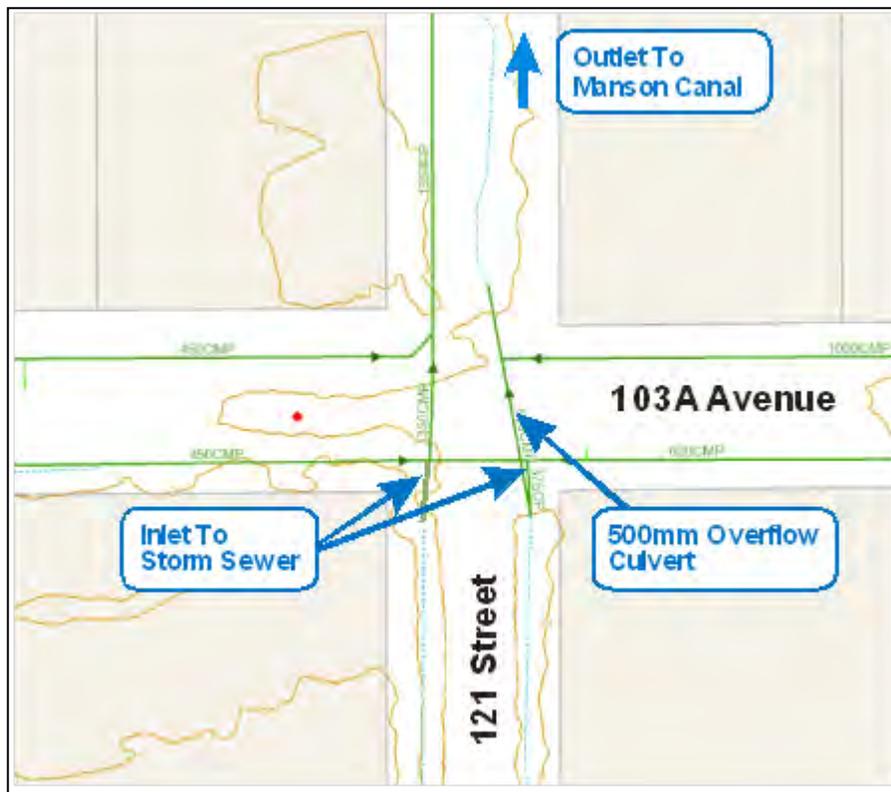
Conveyance Piping at Intersection of 121 St and 103A Avenue
